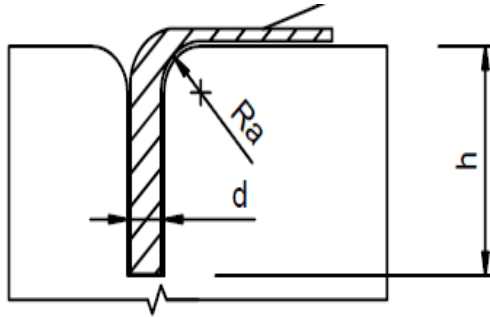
Details of CFRP anchors (Pham, 2009)
